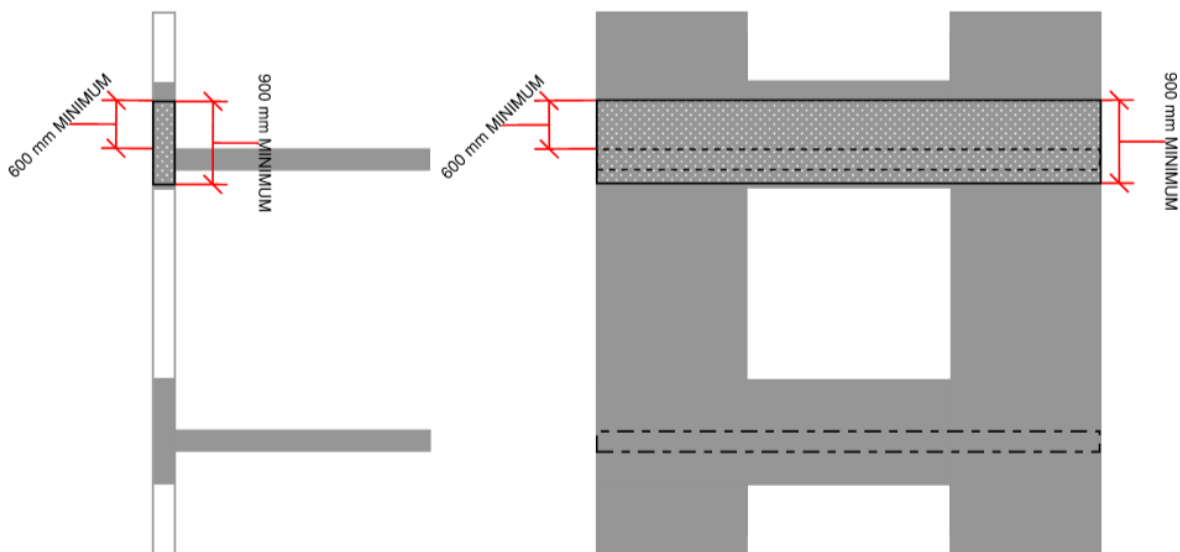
Cross section (left) and elevation view (right) for vertical configuration removal
